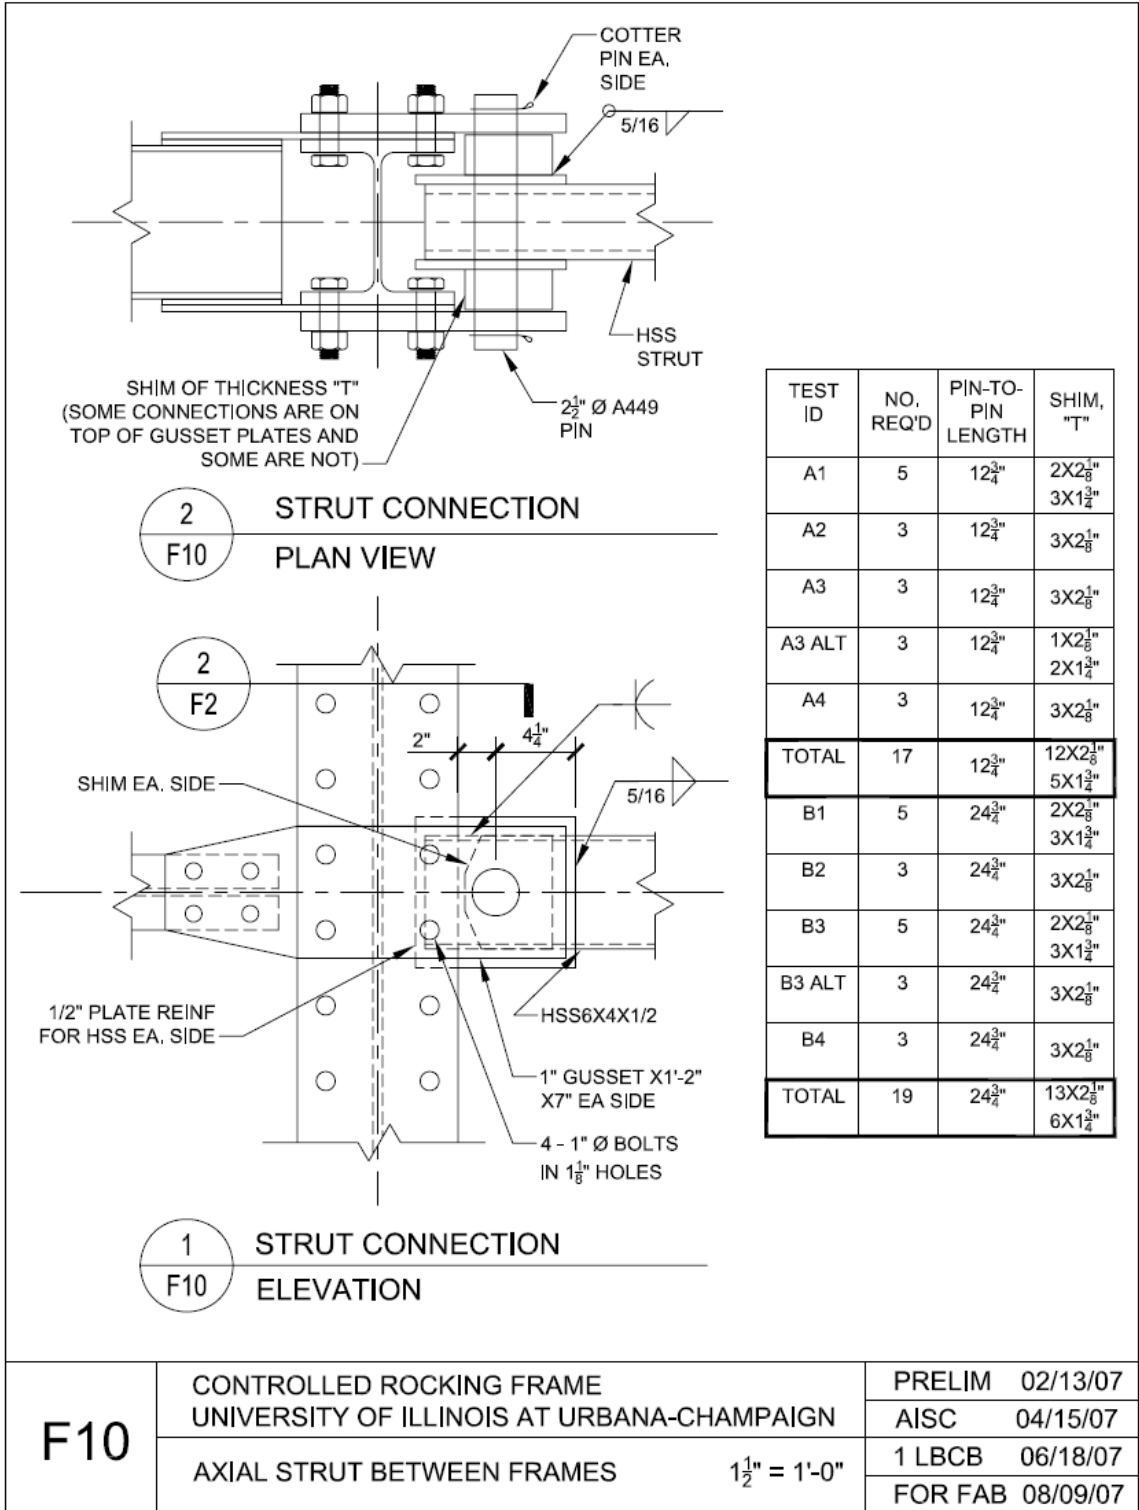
Specimen Design Drawing – Axial Strut Between Frames
